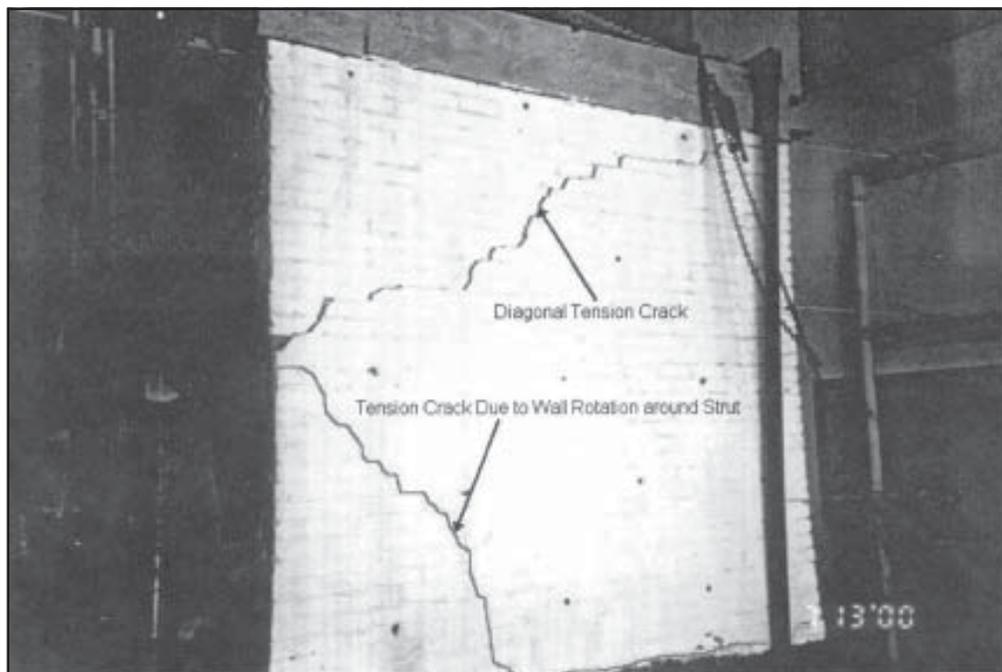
Failure of the In-Plane Laterally Supported Retrofitted Wall with Extra Axial Load and Anchored to Foundation with Fiberglass and Steel Chain
